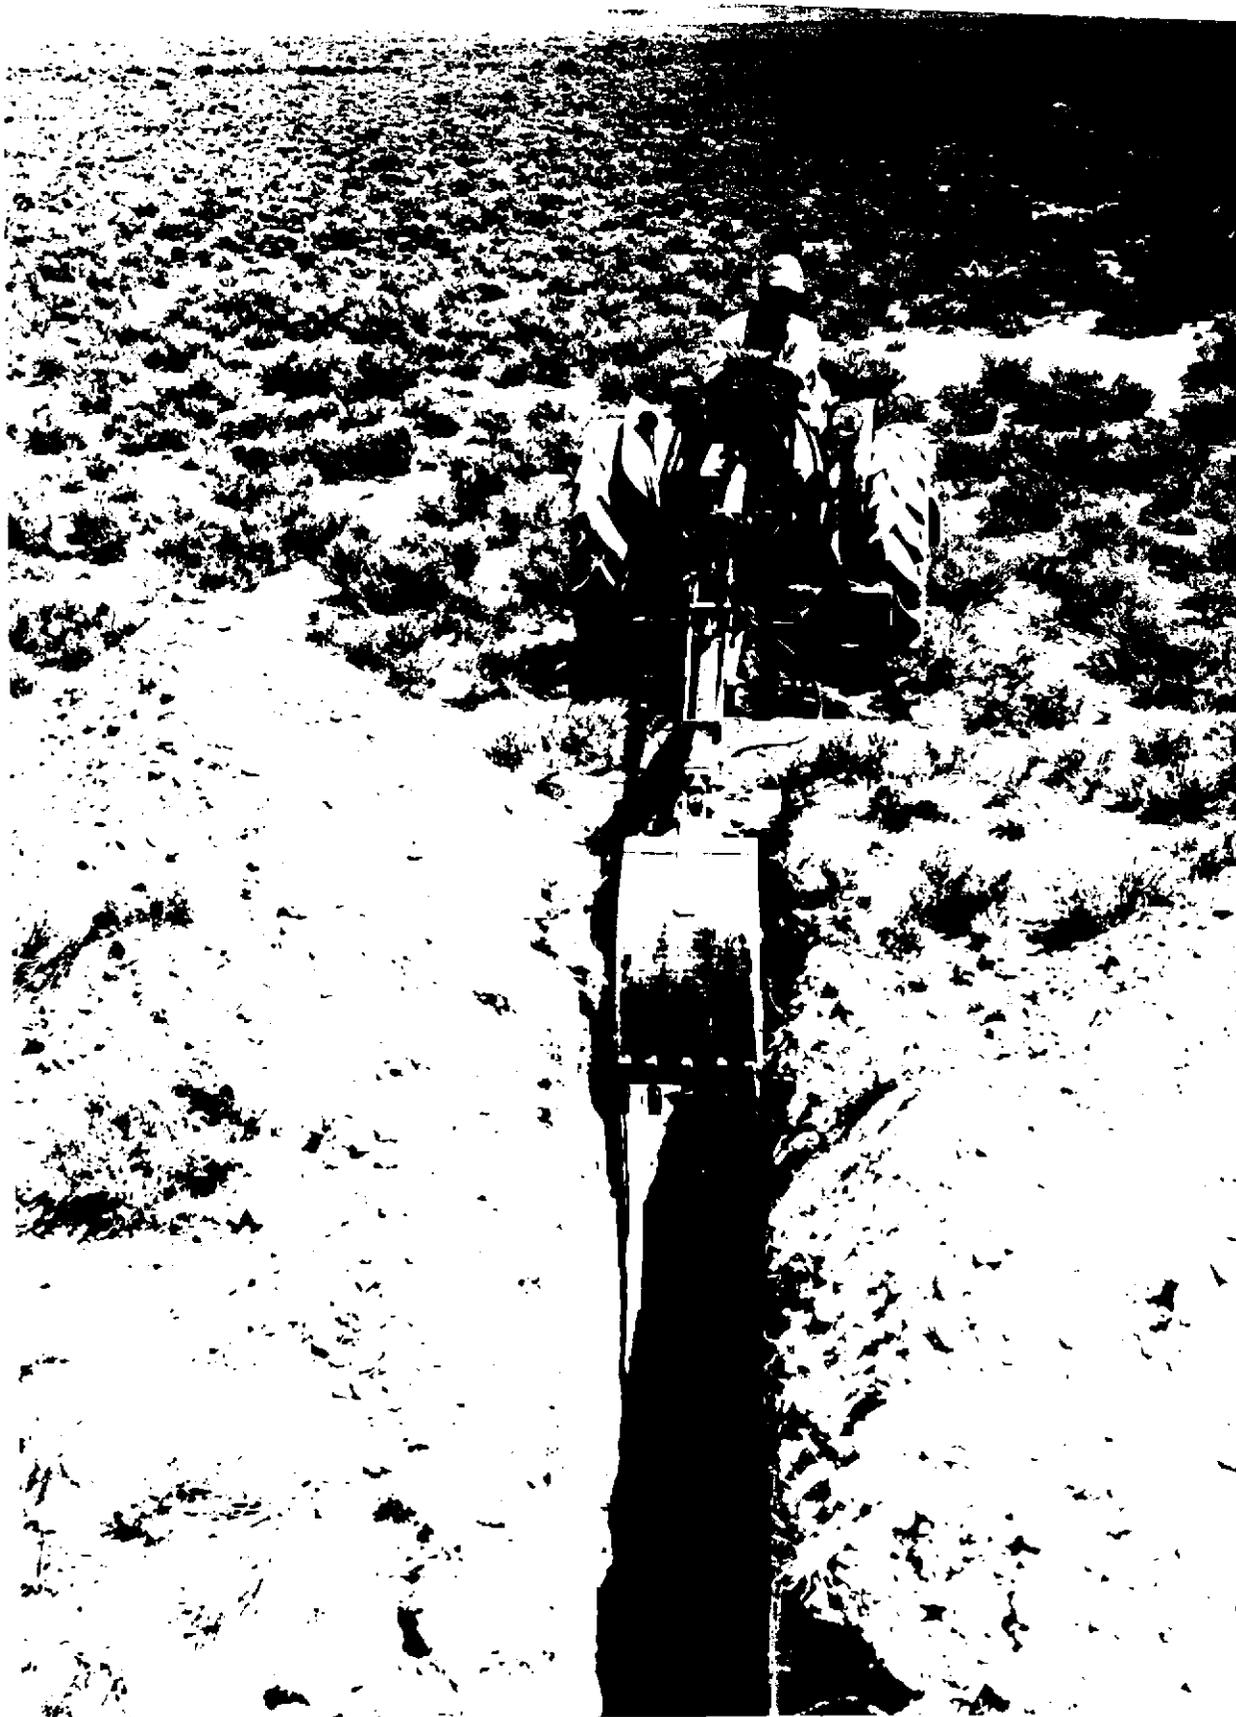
Shawnee Pull-hoe digger used to excavate trenches for soil profile study. A shadscale-sagebrush alterne appears in the background.
